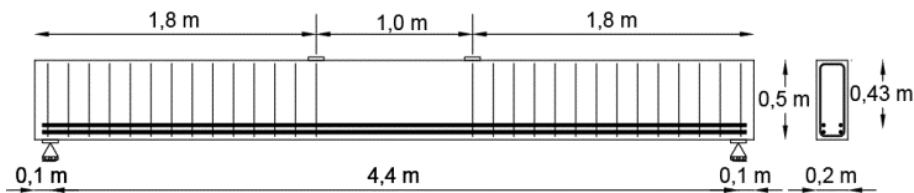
Geometry and reinforcement of beams R1 (sound) and D1 (degraded)
